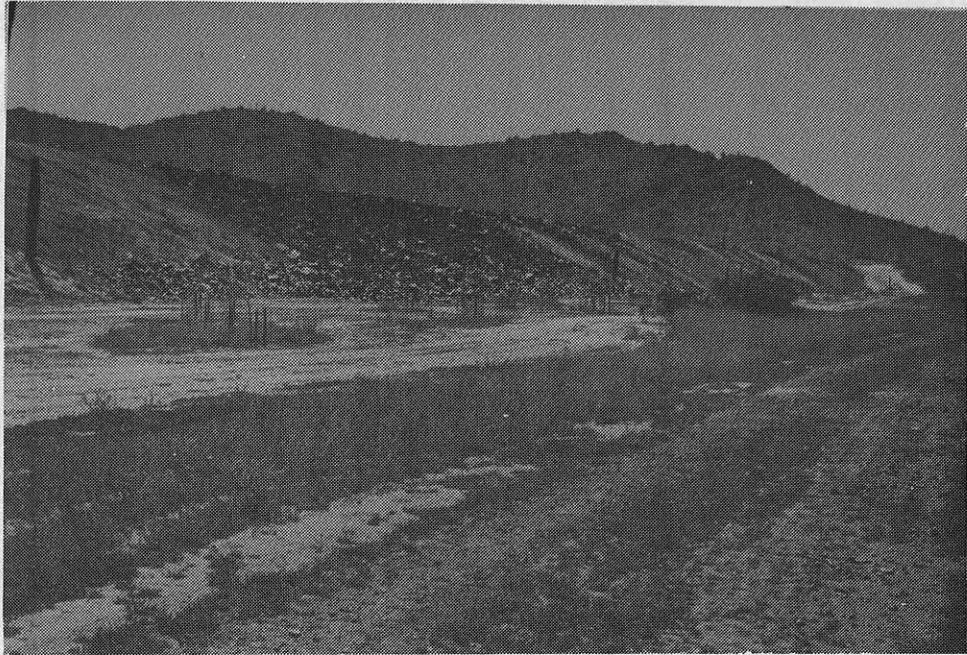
View of landscaped downstream face of dike no. 1 embankment looking toward south abutment. March 1985
